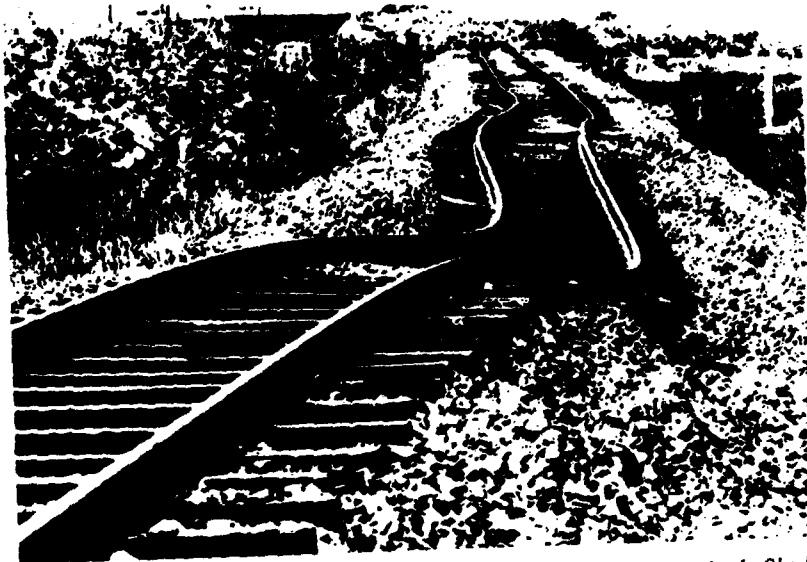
Failure of railway embankment (1983 Nihonkai-Chubu earthquake)
